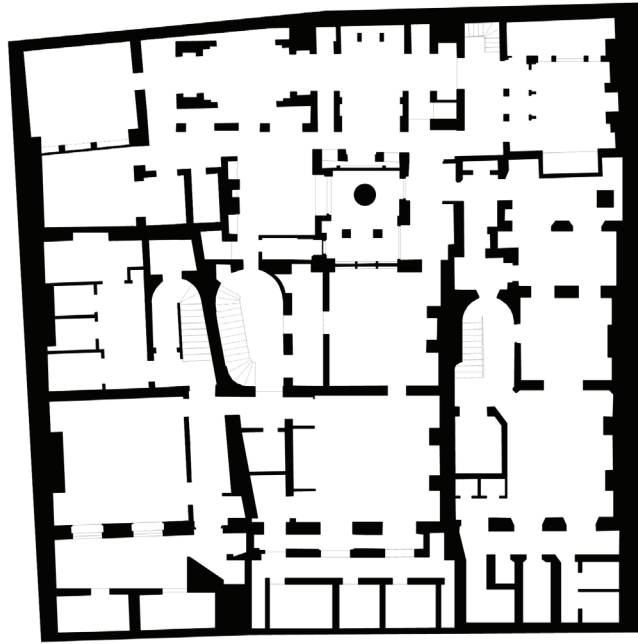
Basement Floorplan Sir John Soane's Museum, scale 1:400
